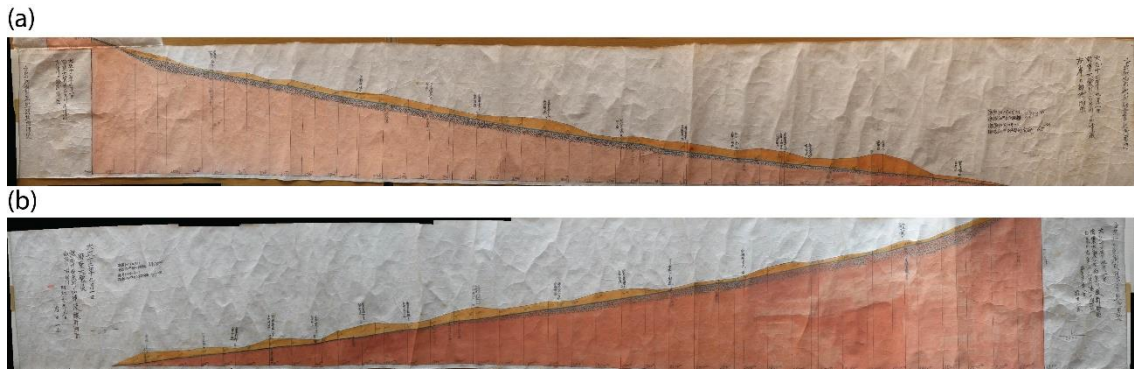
Elevations of bank of Shiraito River illustrated by Mr. Kazumasa Uchida , (a) left bank elevations, (b) right bank elevations (Kanagawa Prefectural Archives)
